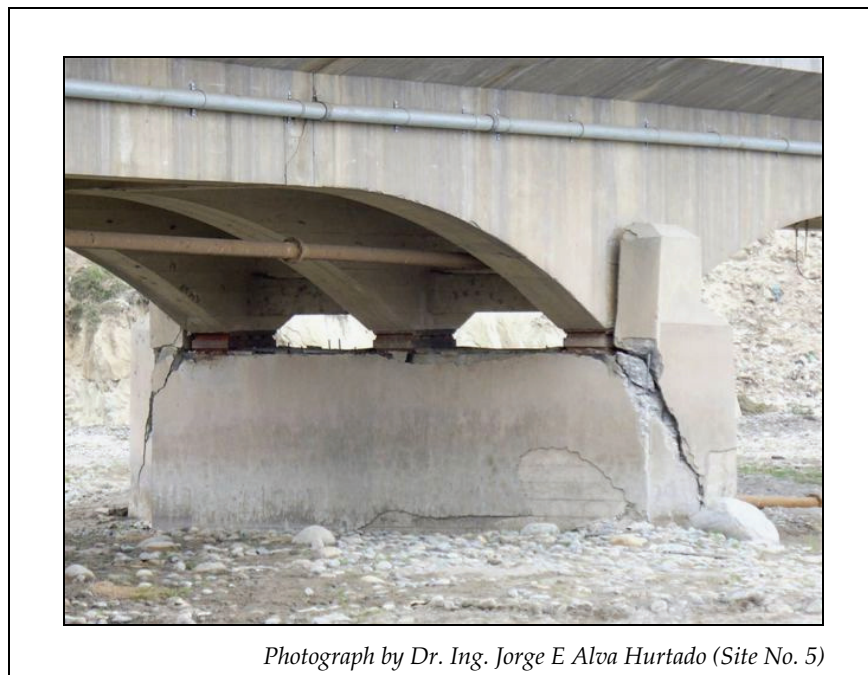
Severe cracking of Pier 2 (from South end) necessitates extensive repair but the horizontal shear blocks managed to restrain lateral movement of the superstructure. This pier has roller expansion bearings.
